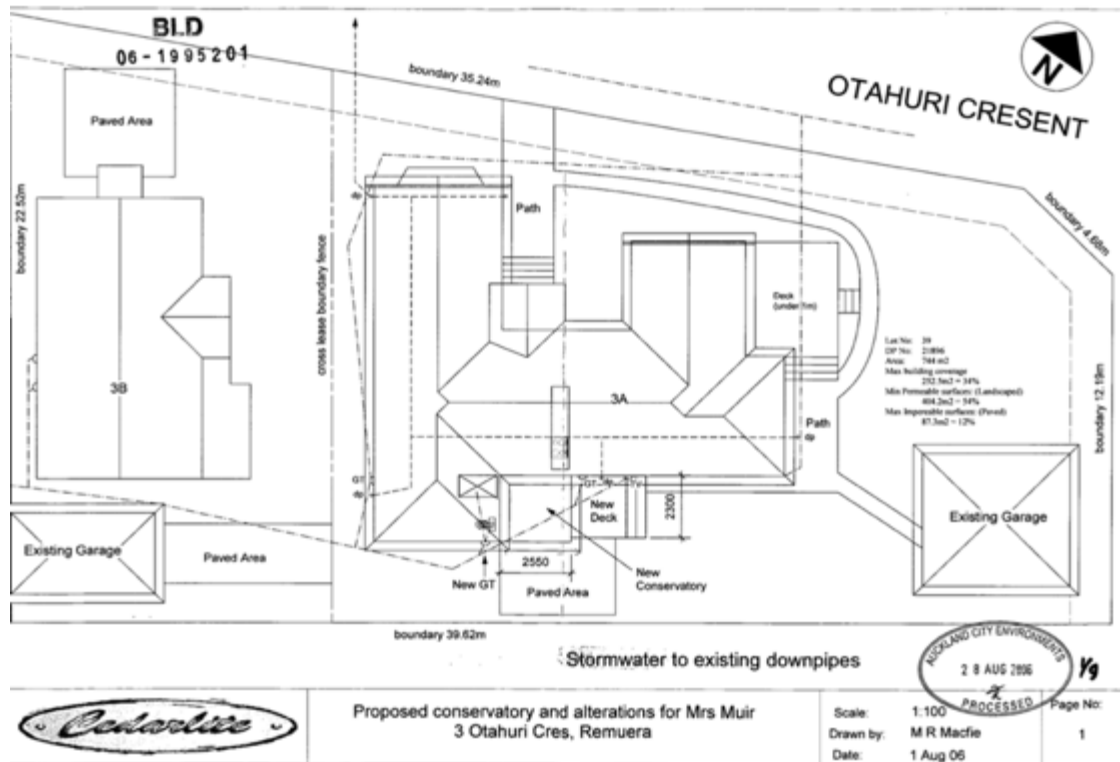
Site plan showing the subject building and the proposed location of the new conservatory, 2006 (Auckland Council property records).
